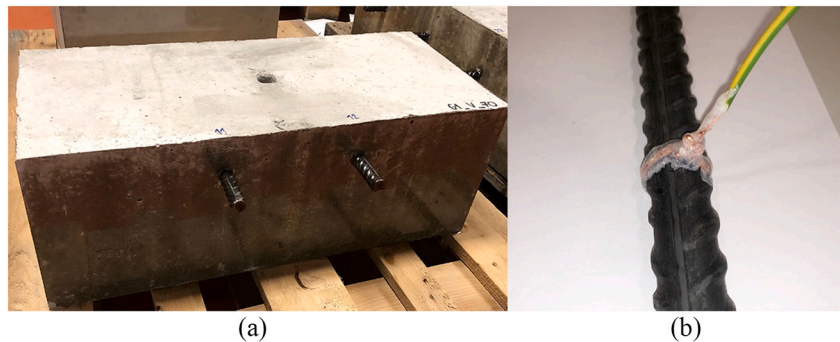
a) Epoxy coated sides of the specimen, b) connection between rebar and wire.
